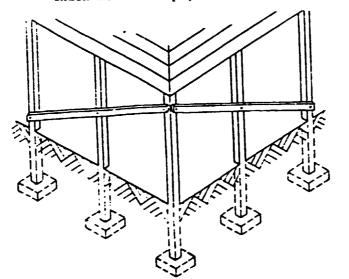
Shows bracing arrangement for the elevated sub-floor where height of wood stumps exceeds ten times minimum width of the stump.
